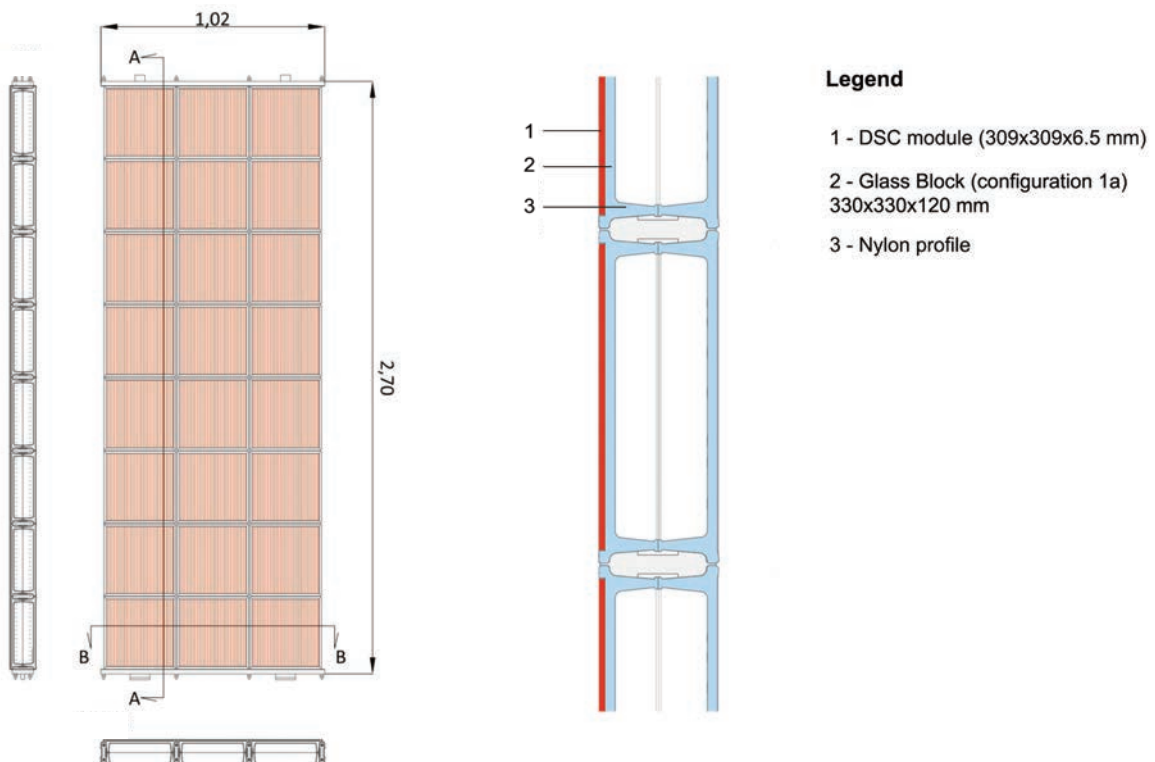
(left) View and sections of the glass block panel and (right) detailed section depicting its basic subcomponents (DSC module, glass shells, plastic profiles)
